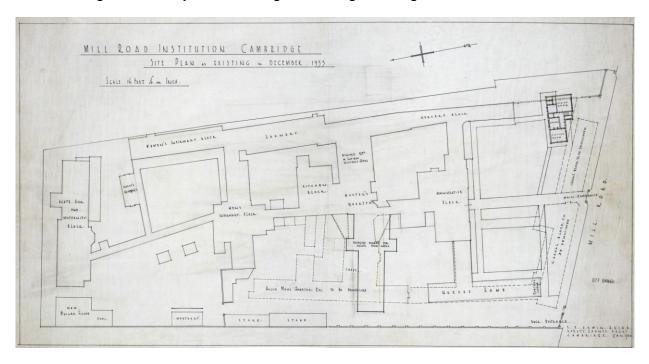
Ground floor plan of the Infirmary (1933) showing the buildings to be demolished at the front of the site, and the location of the Nurses' Home (built1934-5) and the intended Master's House (built 1935). Source: Cambridge Archives: KCC7 Arch SS2 7.07704860
